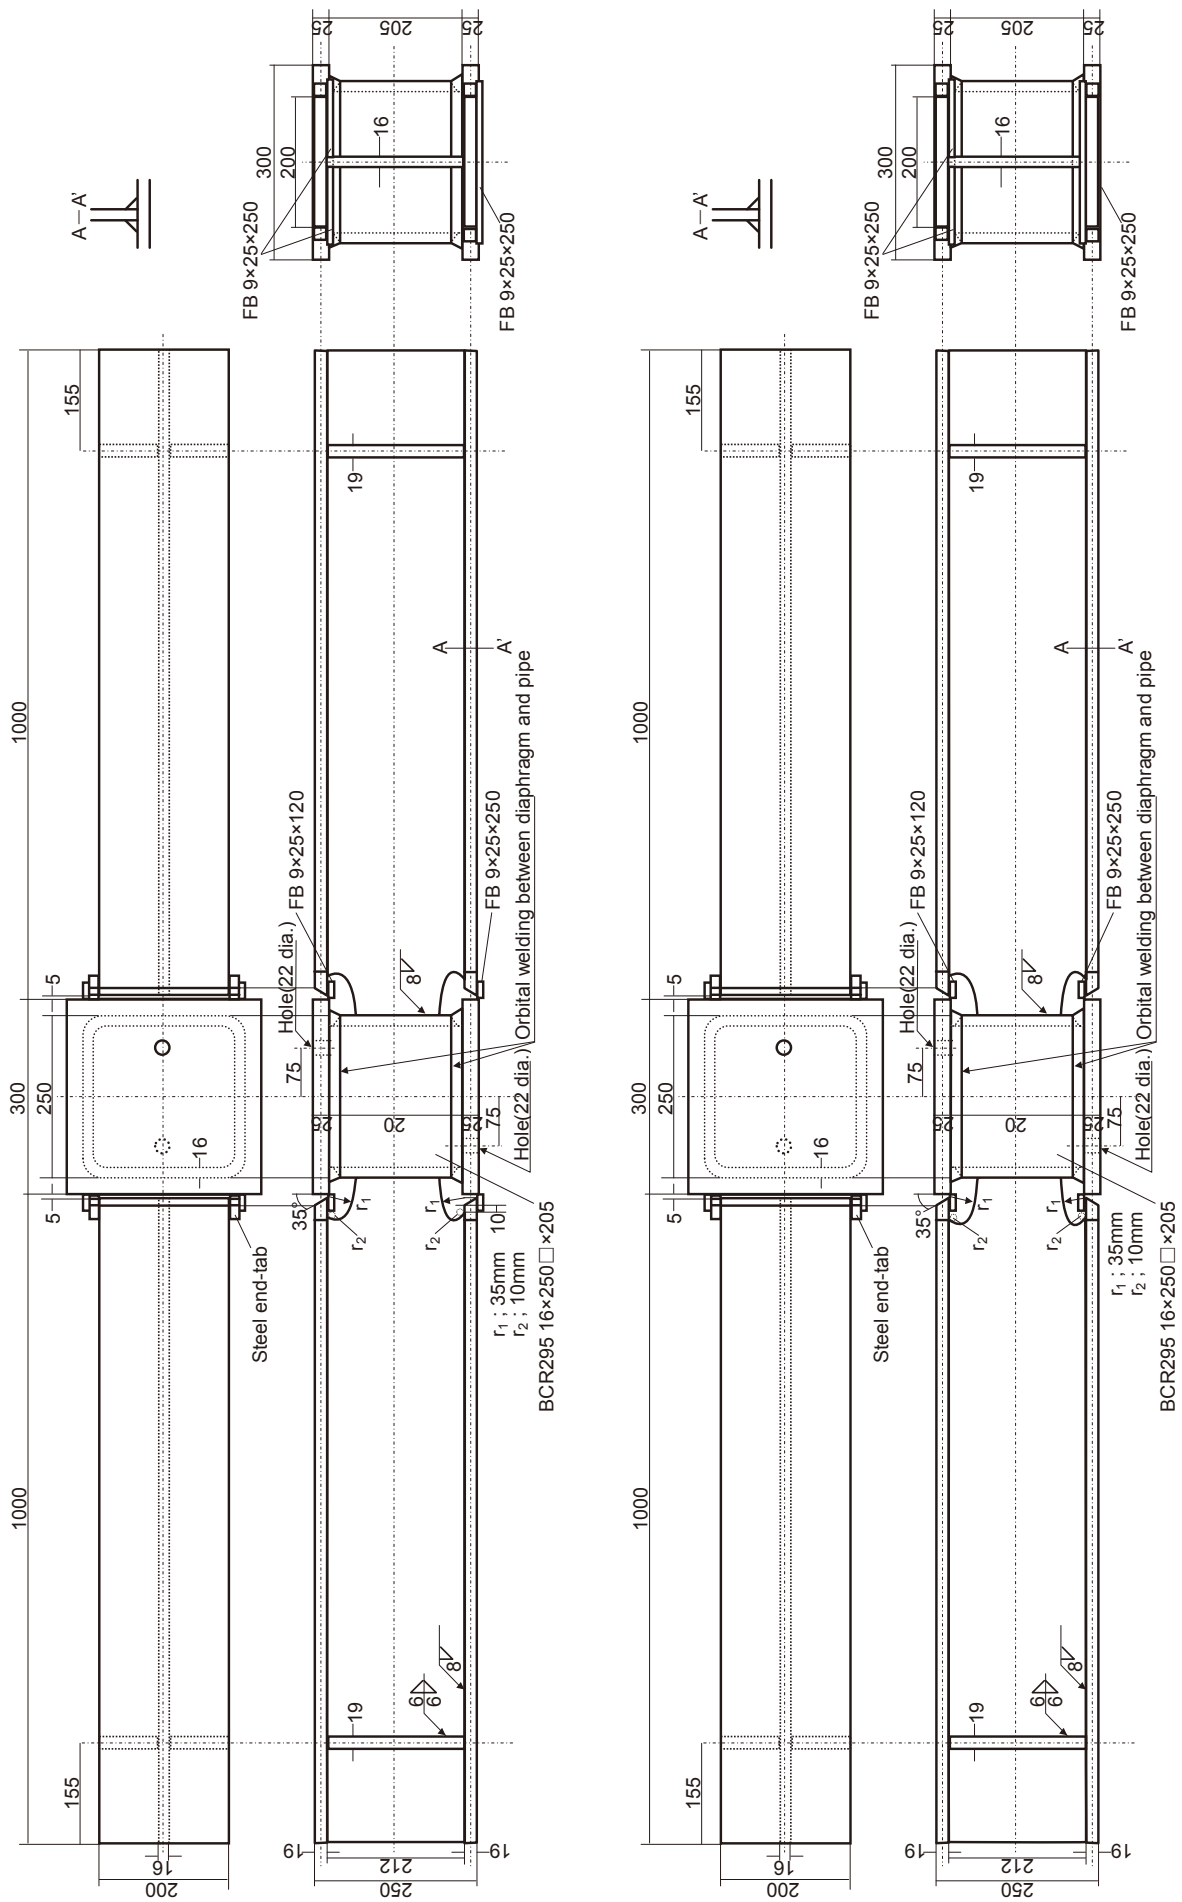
Schematic plan for the three point bending test of full-size beam-to-column assemblies
